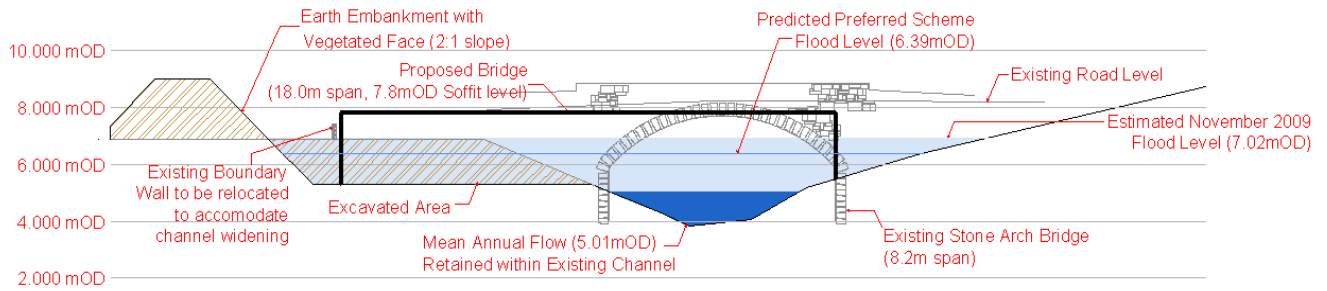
Proposed Works at Killeely Beg Bridge
